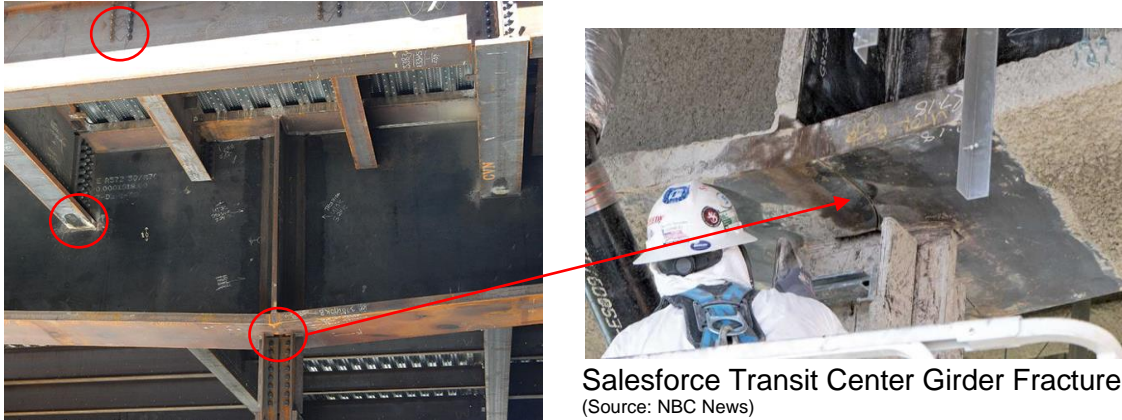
Stress concentration leading to failure of a steel girder.
